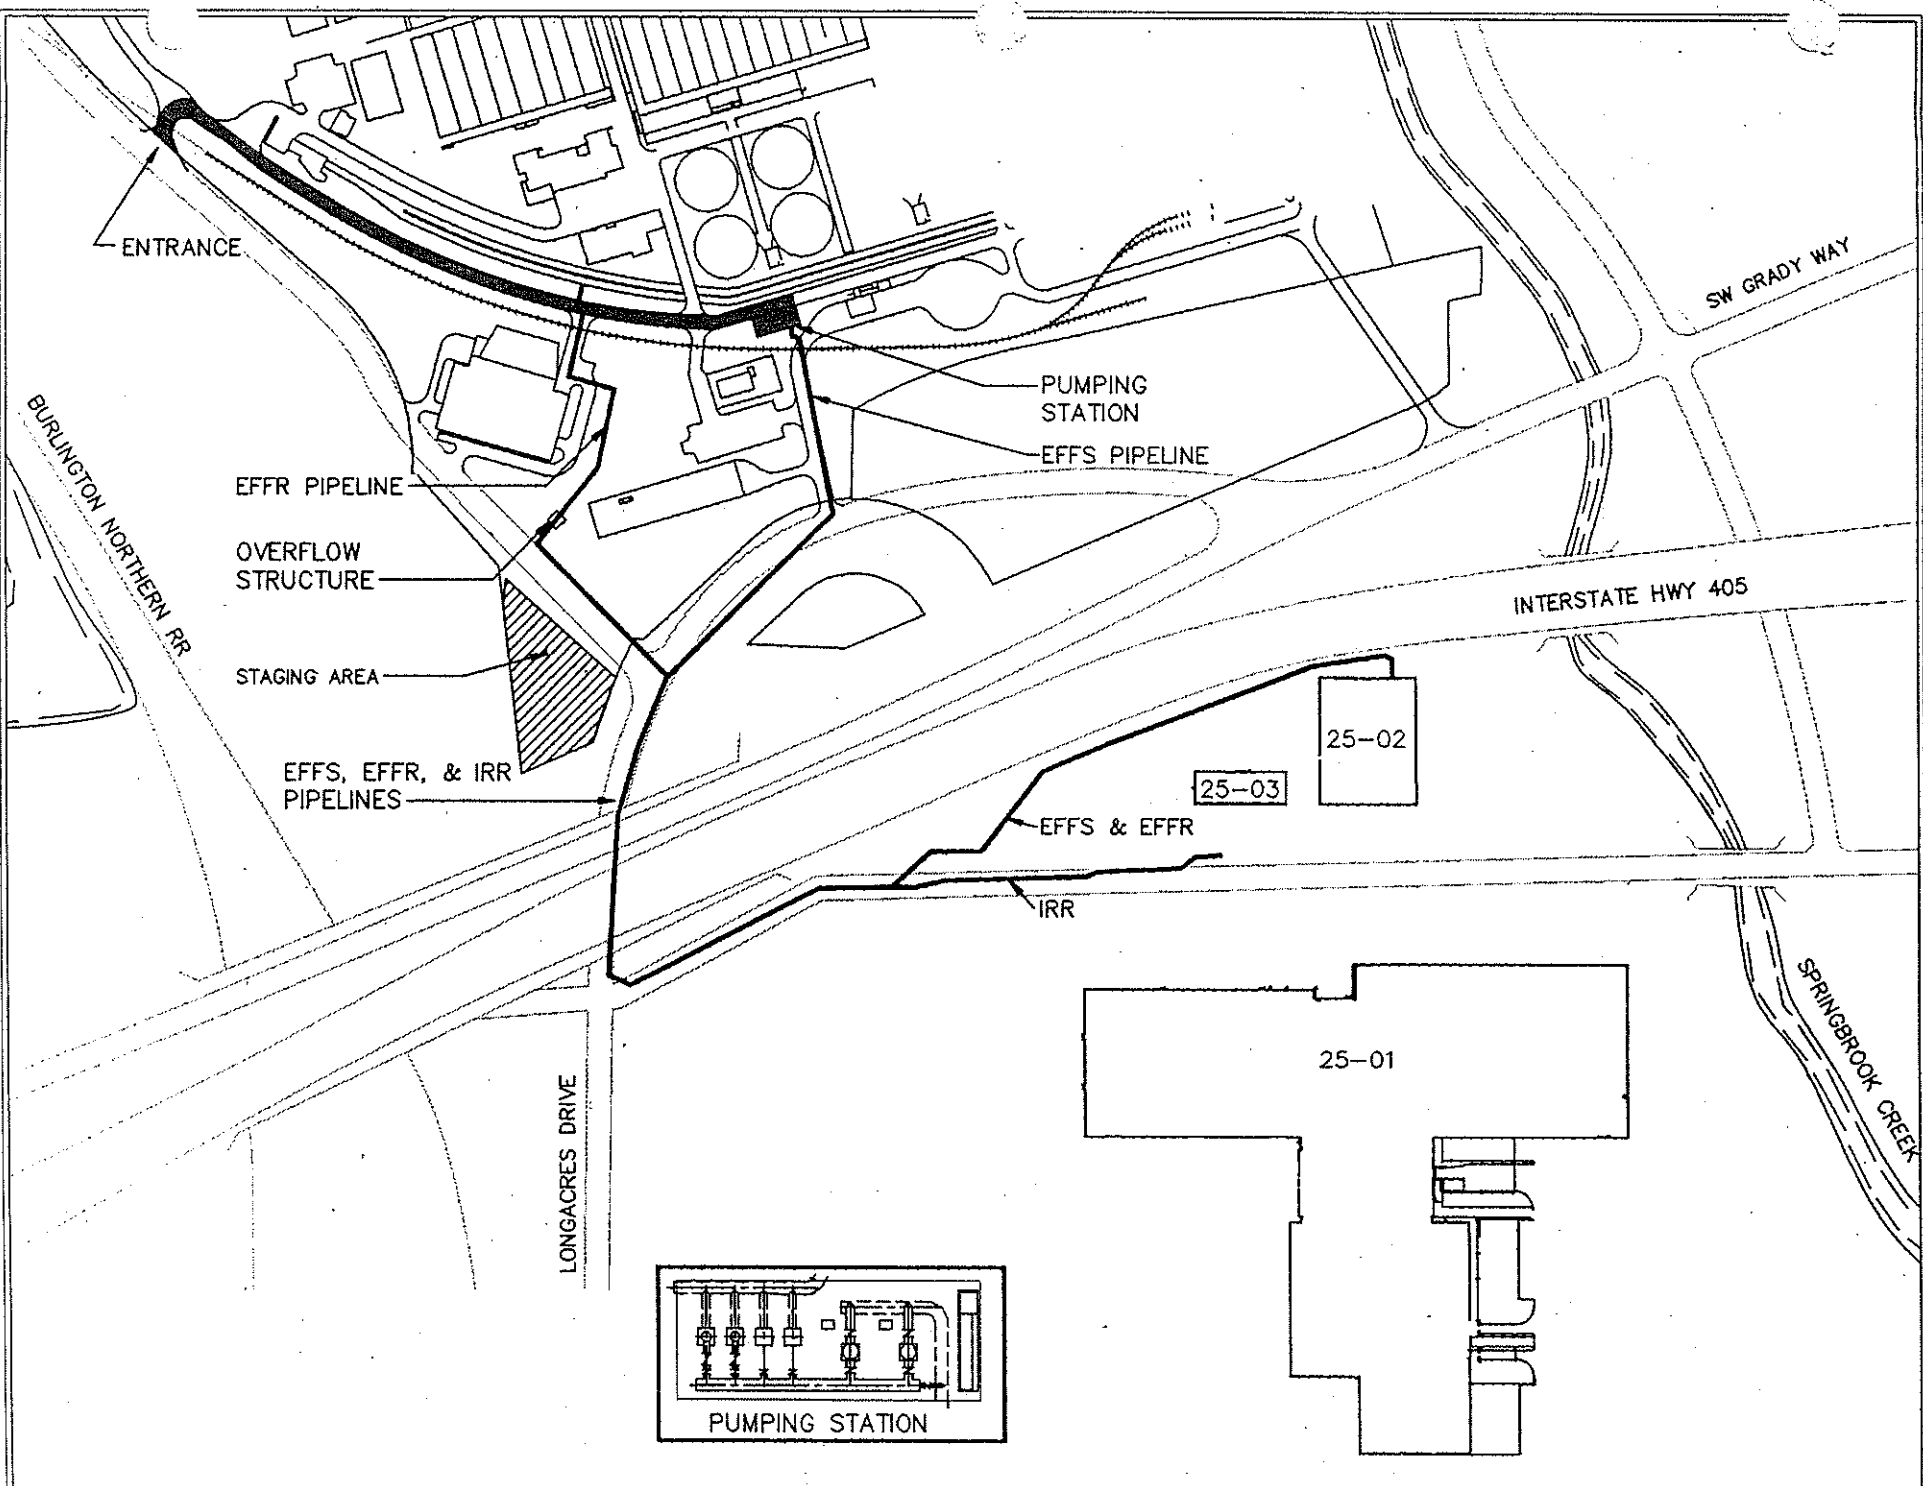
EXHIBIT B: BOEING CHILLER PROJECT SITE PLAN
